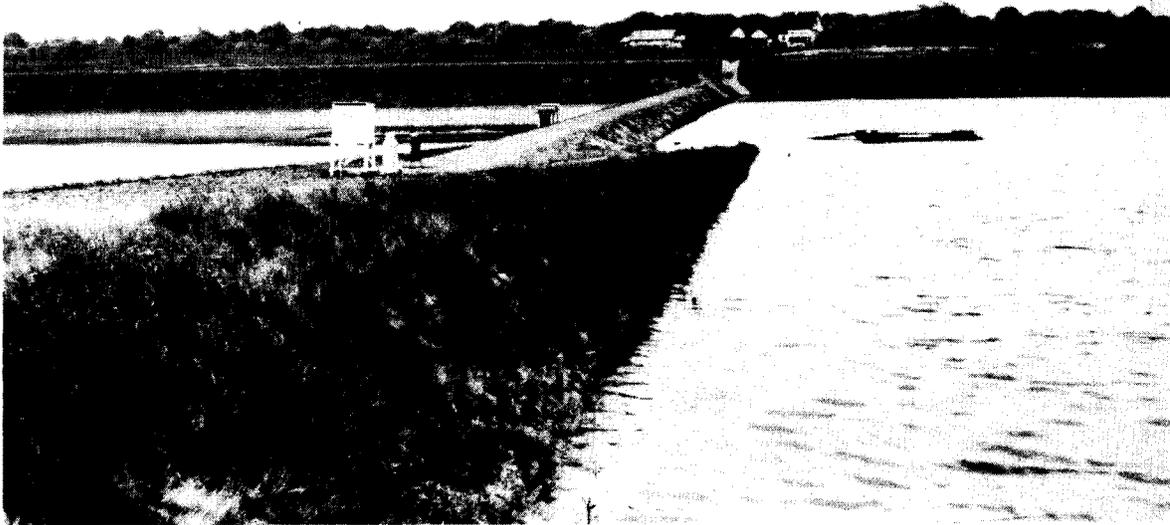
PHOTOGRAPHS SHOWING THE OVERFLOW SPILLWAY AND THE EMBANKMENT BETWEEN THE NORTH AND SOUTH UNITS, ROCKAWAY ROAD RECHARGE BASIN, GARDEN CITY, NEW YORK. (Courtesy of Department of Public Works, Nassau County, New York)
